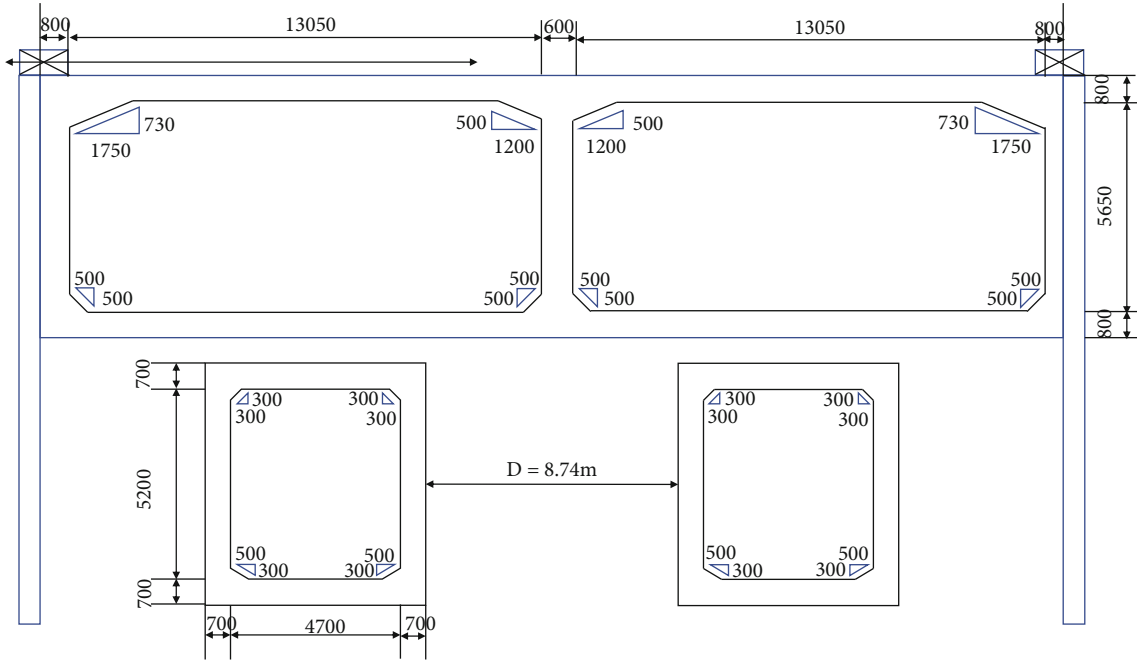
Specific parameters of a typical section of Aixi Lake tunnel.
